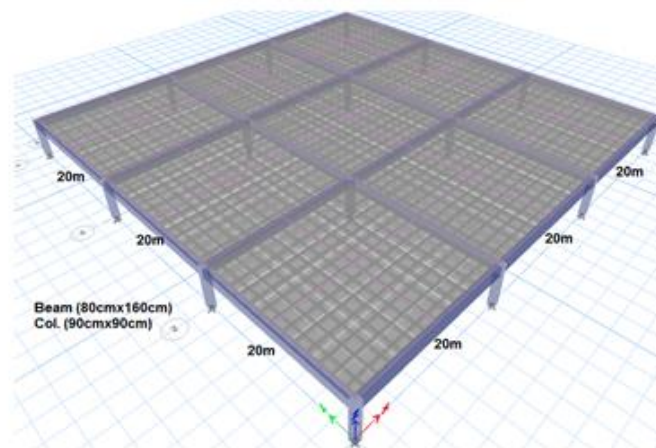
3D-View show Building with one story for Slab Size(20mx20m)
